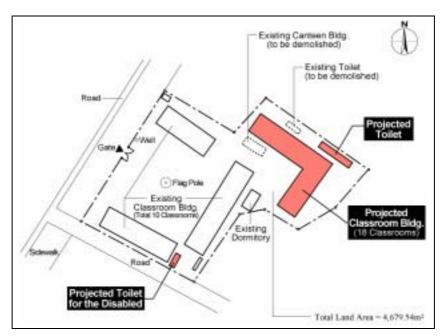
Layout Plan of Phuom Russey Primary School, No.6
